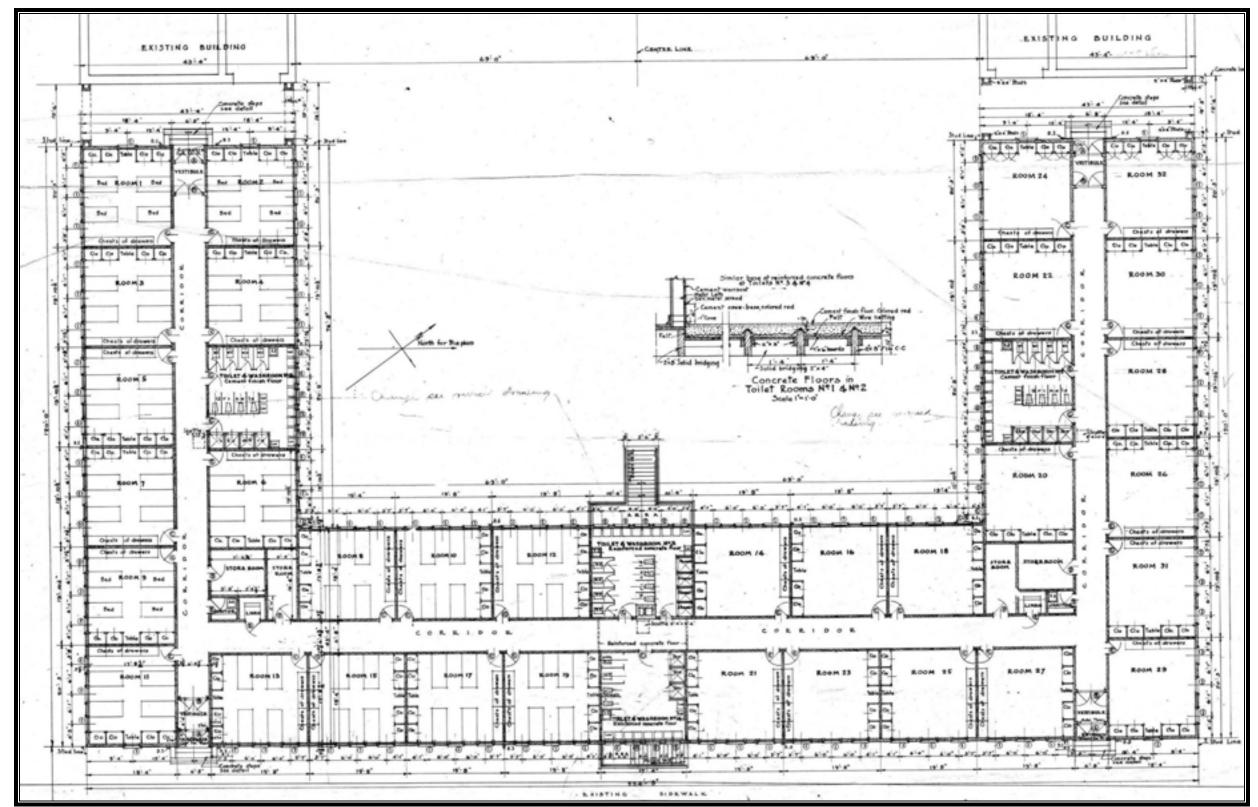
Building I extension, 1937 (Courtesy Naval Air Station North Island)
